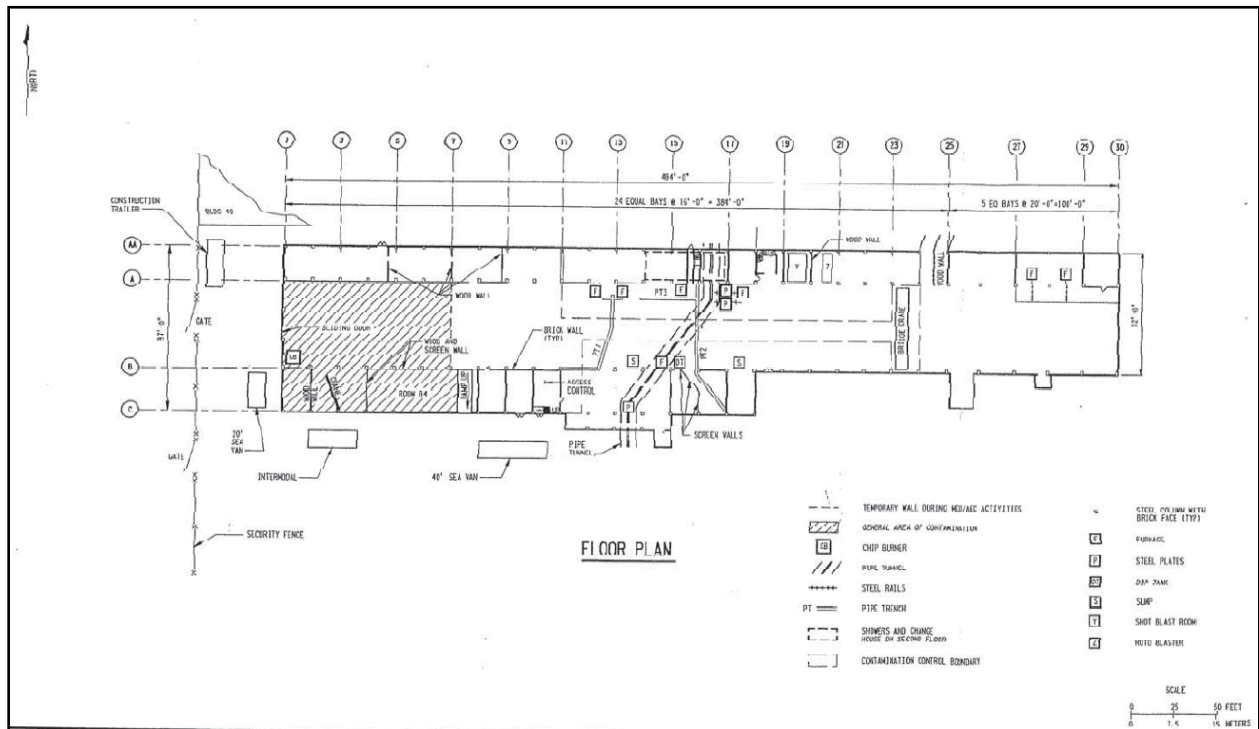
Floor Plan of Building 23 at the Indian Orchard Site
